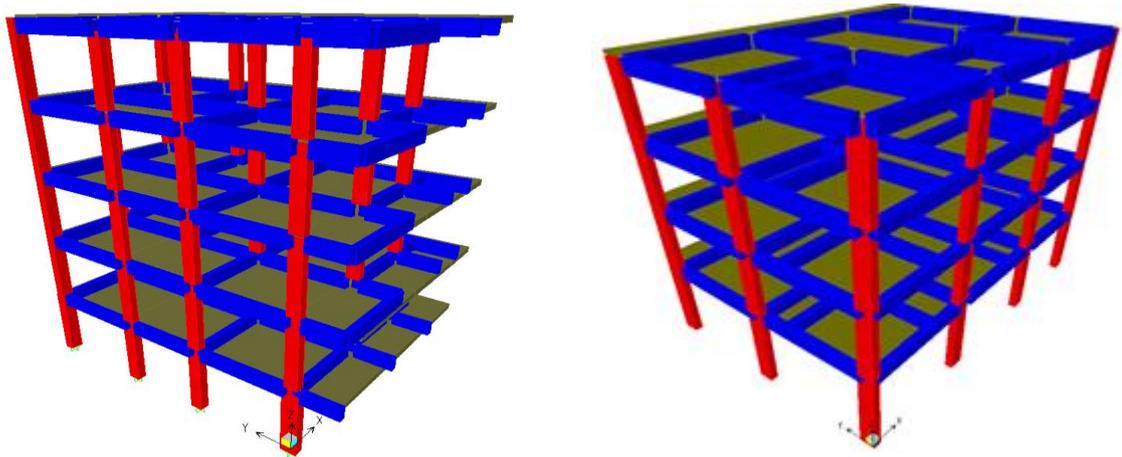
3-Dimensional Models of Z1 and Z2 buildings
